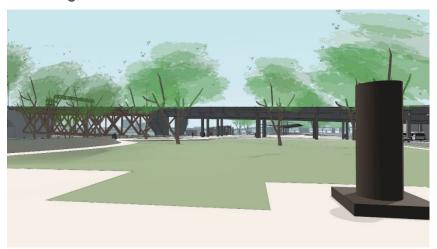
View in Waterfront Park Under Bridge from Japanese American Historical Plaza - Draft EIS Long-Span, Tied-Arch
